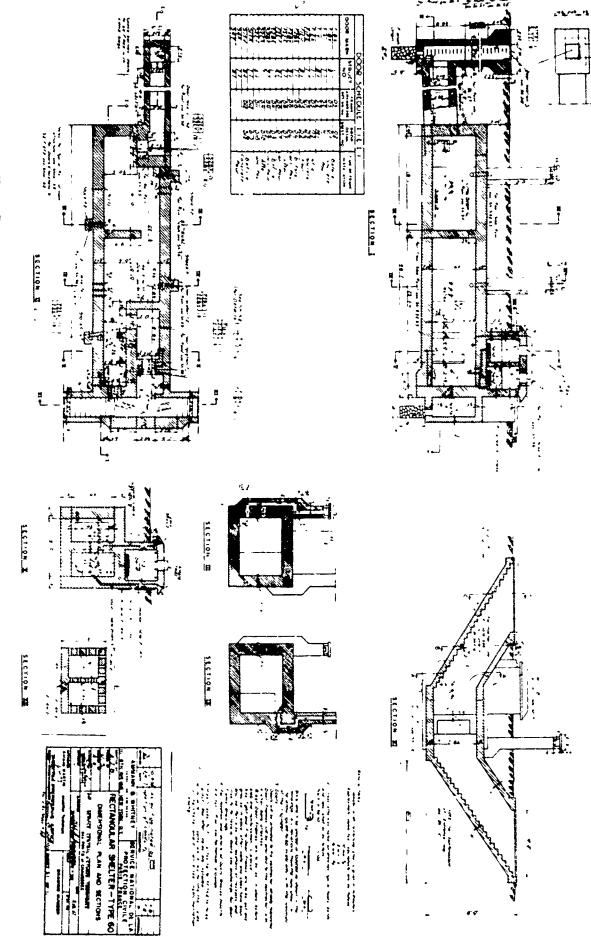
Rectangular shelter, type 60, dimensional plan and section.
